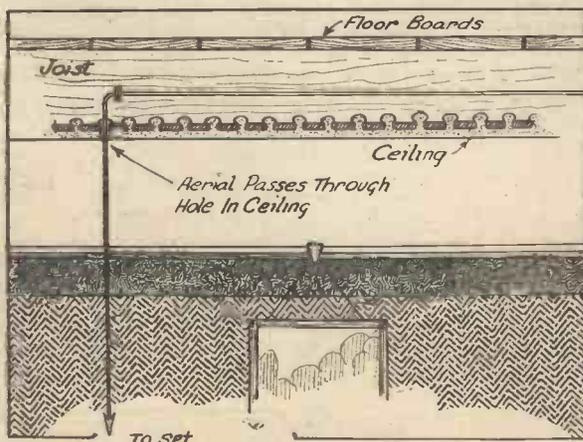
Aerial running between ground floor ceiling and floorboards of room above.
